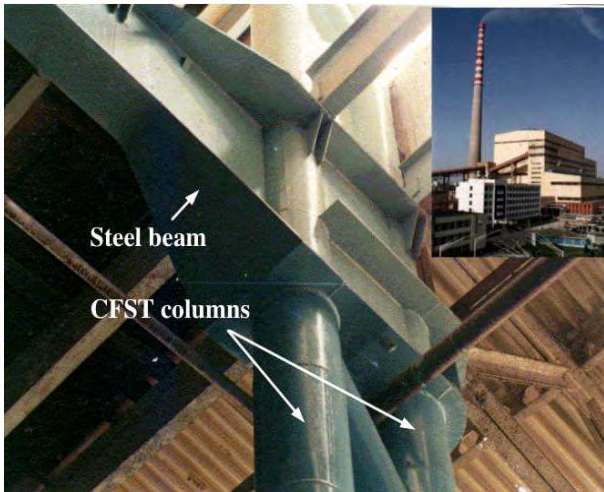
Power plant workshop using CFST columns (Ren et al., 2014)
